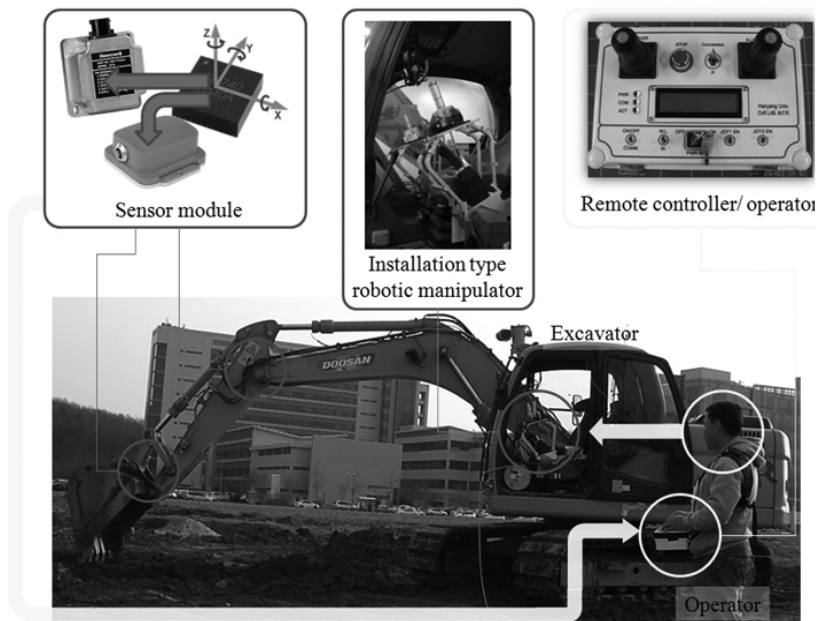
Installation type (detachable) tele-operated excavator without renovation and remodeling
